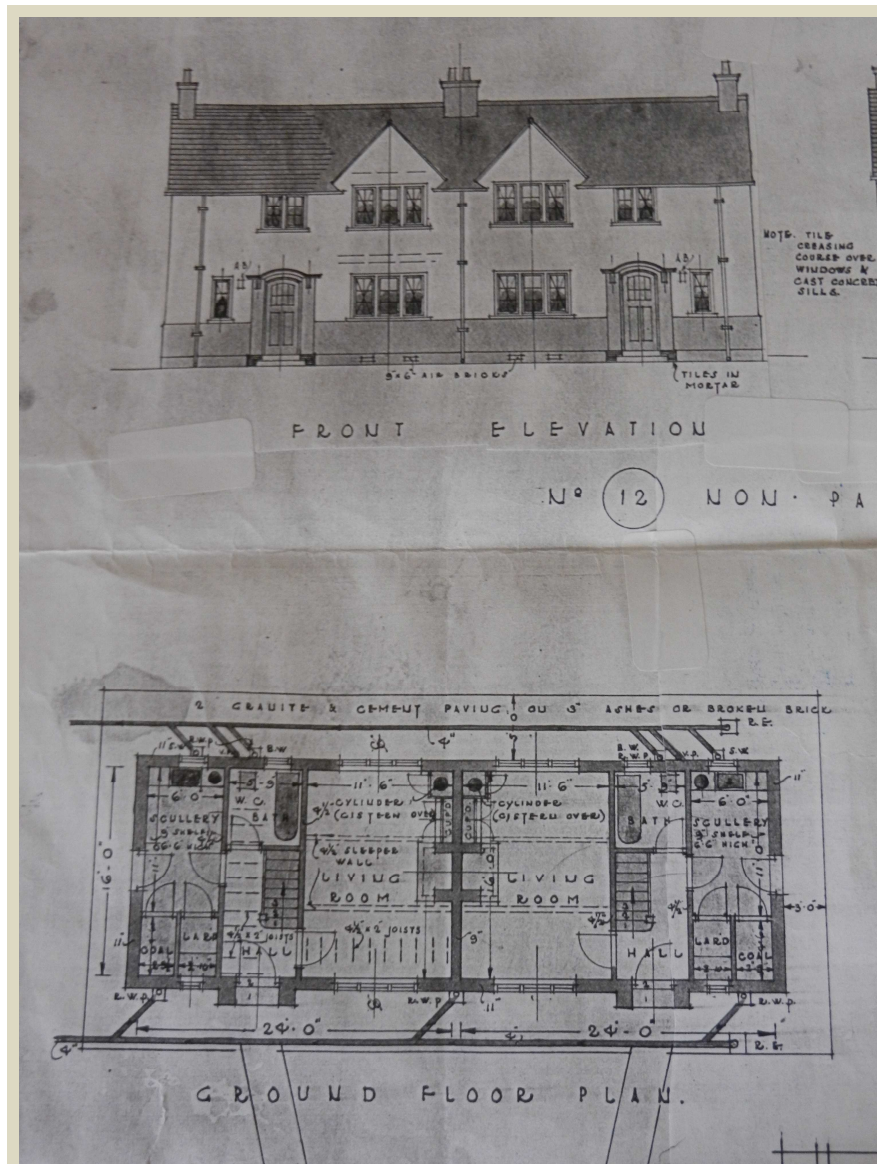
'Front elevation' and 'ground floor plan' of the 'north aspect' houses.
